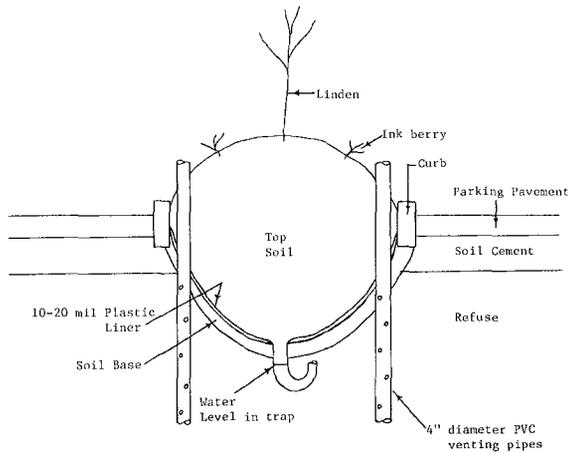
Gas protection for vegetation planting island in a paved parking lot located over a former refuse landfill.
